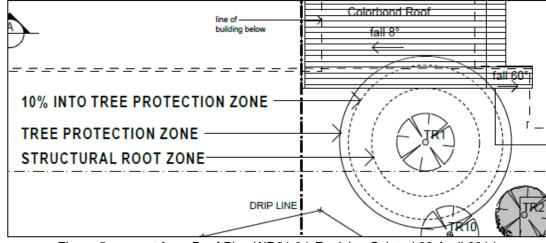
excerpt from Roof Plan WD21.04 Revision C dated 23 April 2014
